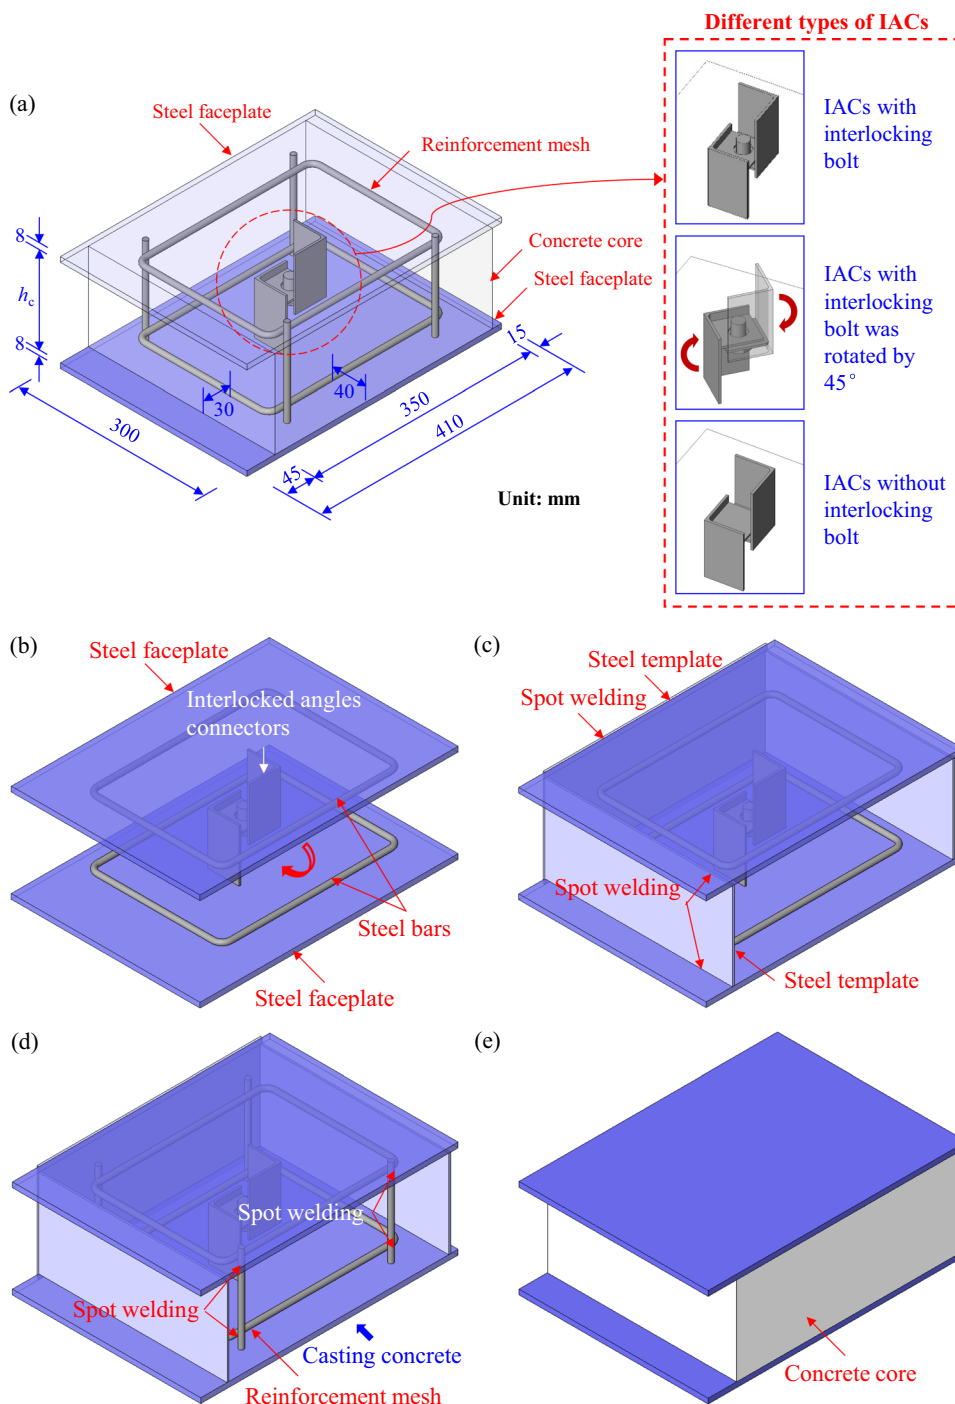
Fabrication procedures of IACs: (a) Dimensions of components of IACs, (b) Prefabricating steel angles, steel sheets and interlocking bolts, (c) Welding steel angle, steel sheet and interlocking bolt, (d) Assembling the steel faceplates, (e) Casting concrete
